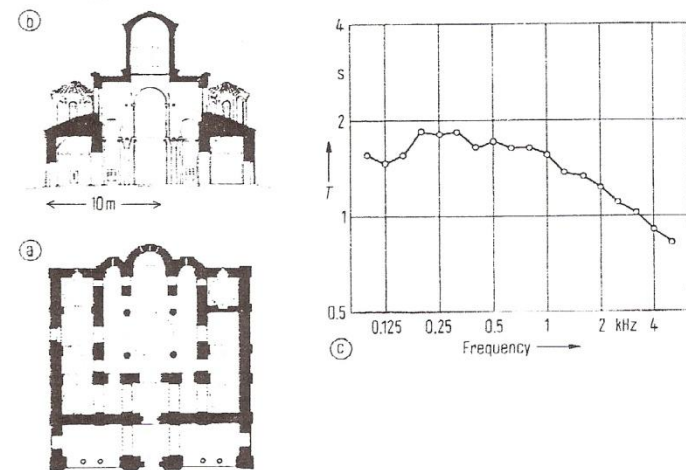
Church of the Holy Apostles. (a) Ground-floor plan, (b) cross-section and (c) reverberation time  $T$ .
